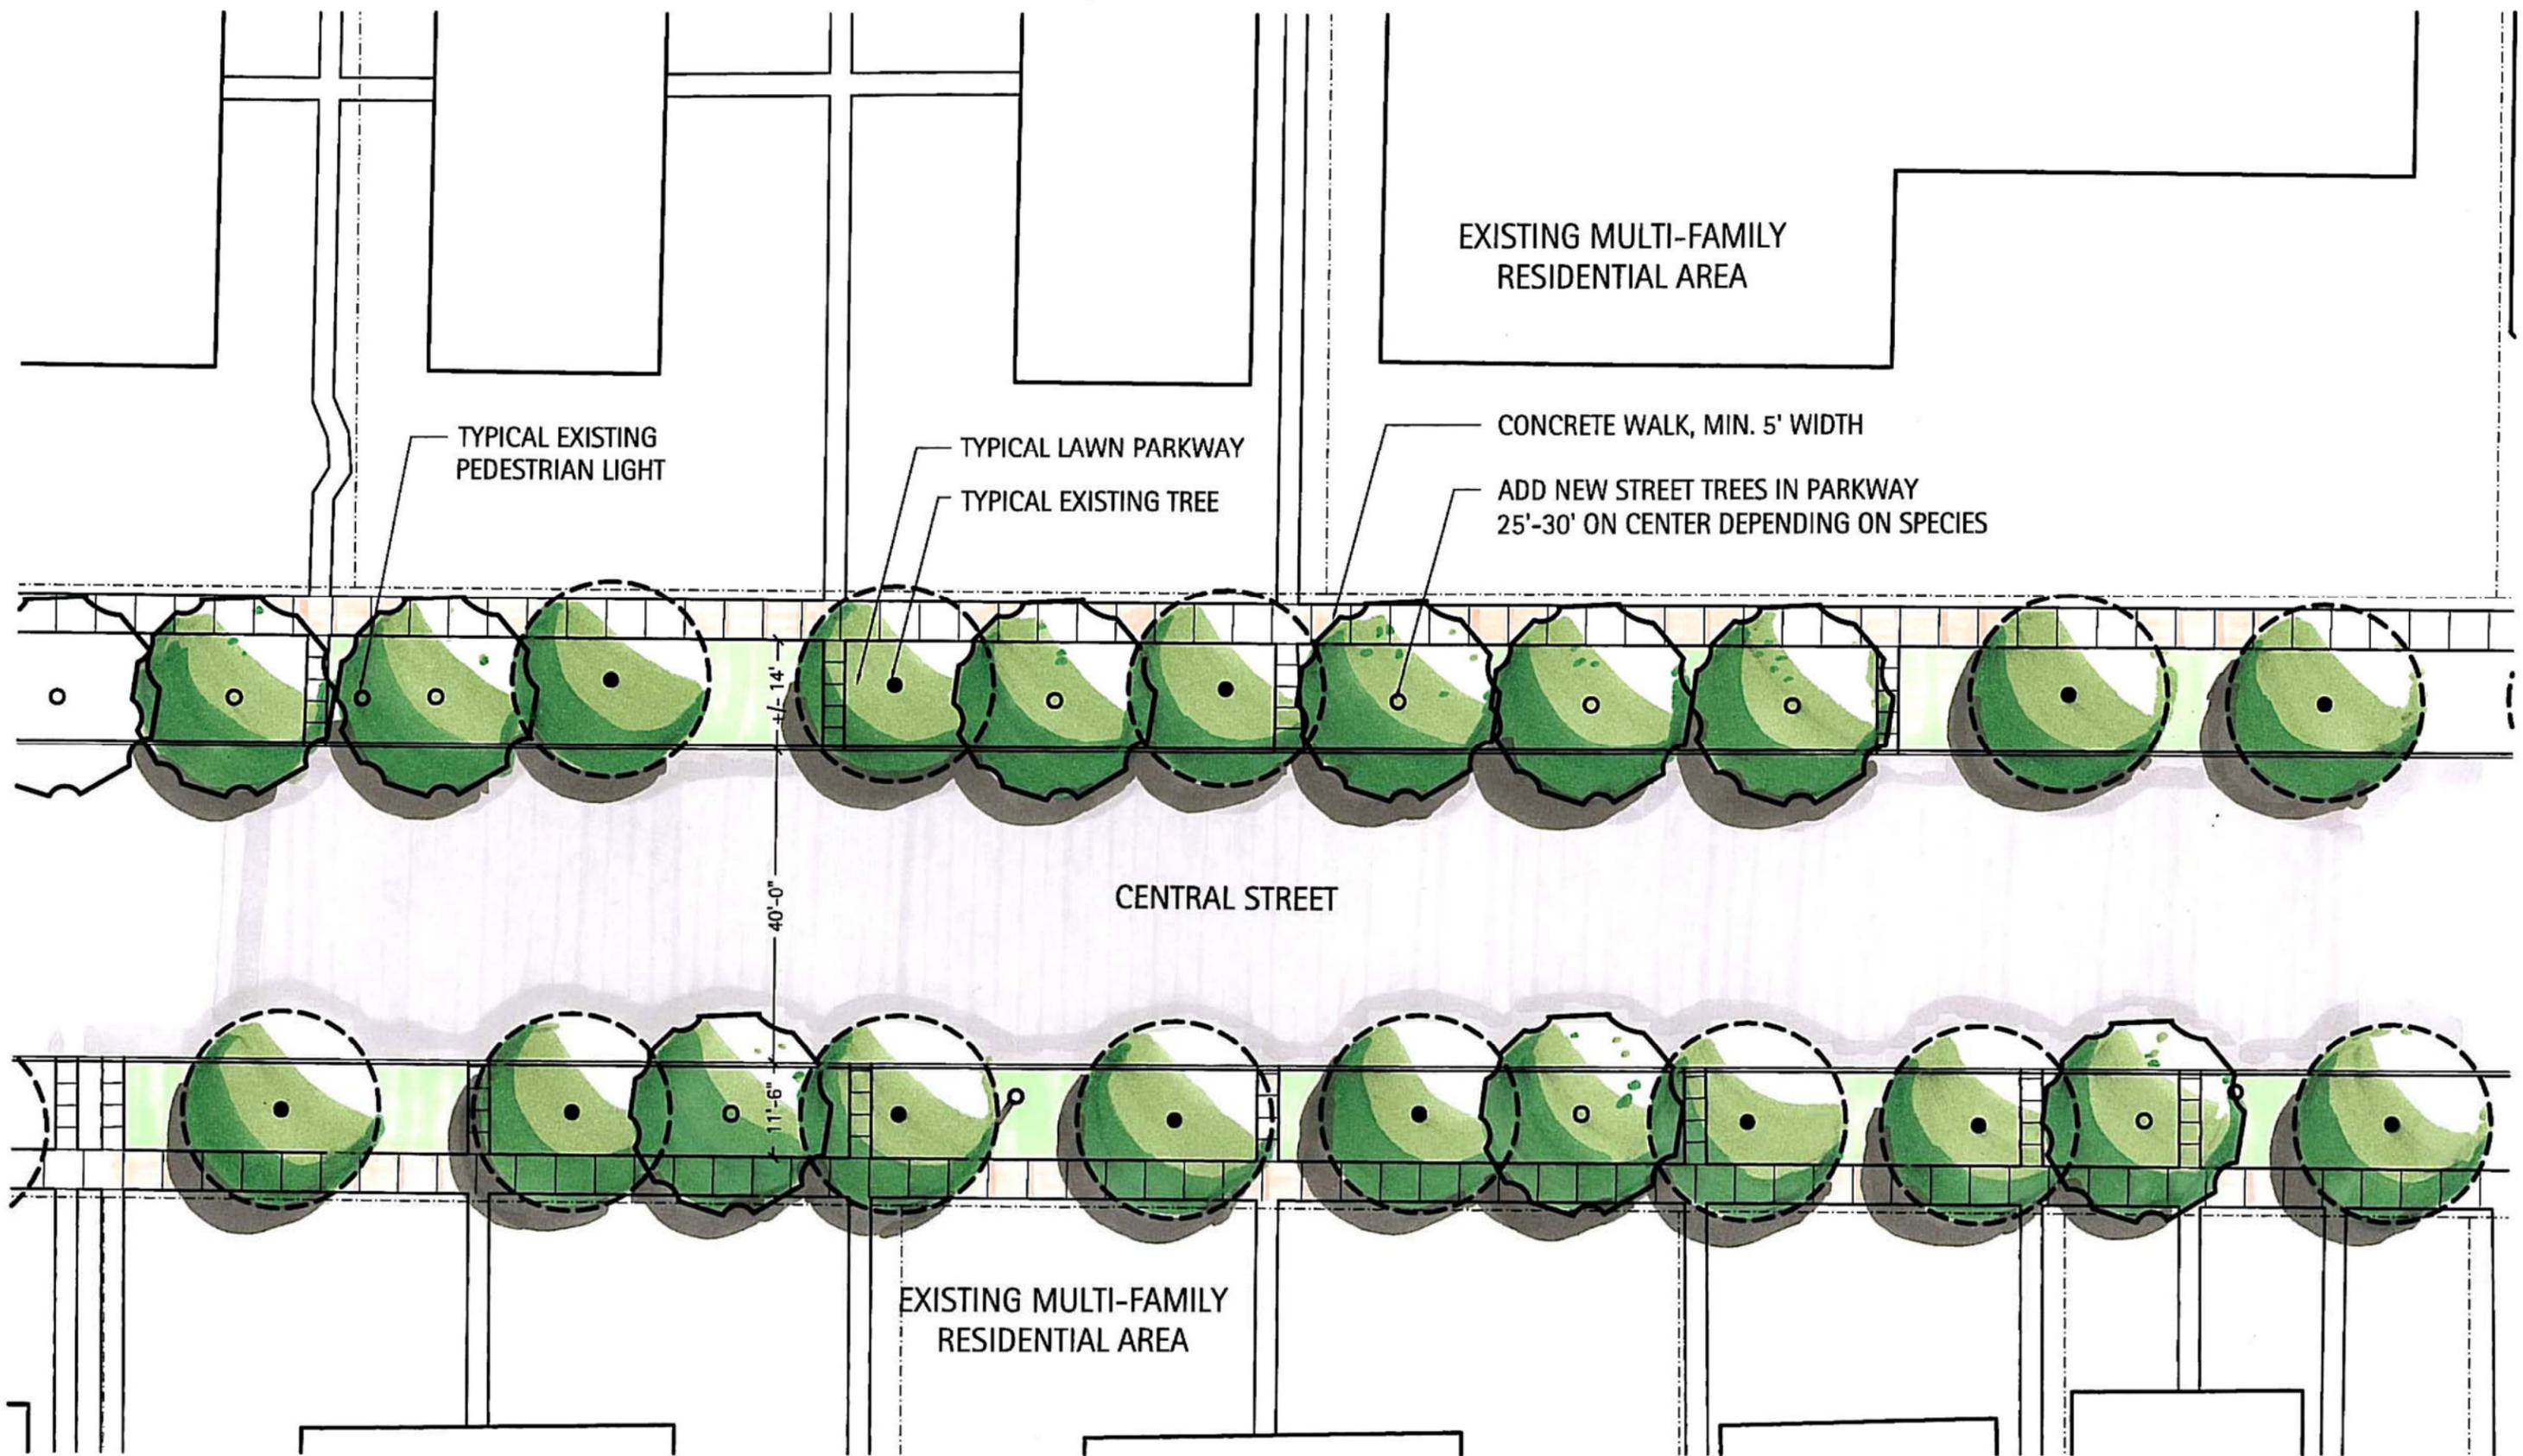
Streetscape Design Concept - Intersection of Central Street + Central Park Avenue
